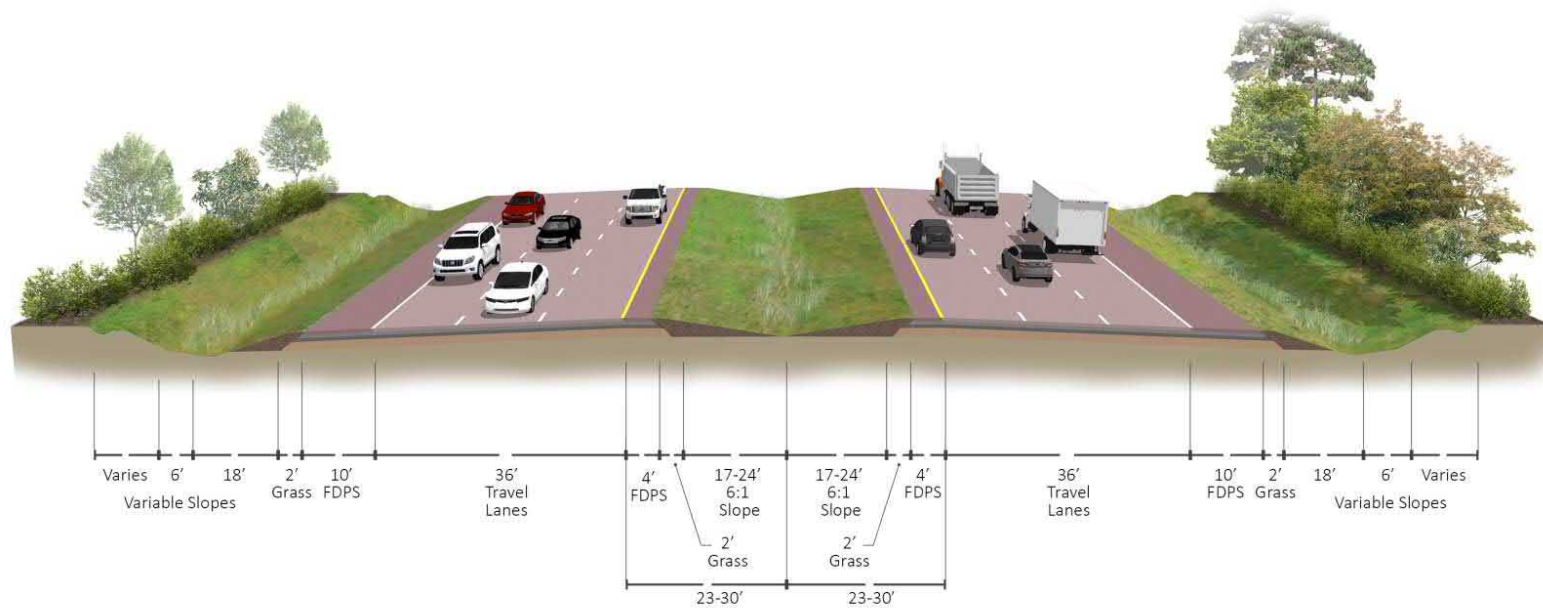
Current Detailed Study Alternatives Typical Section – six-lane arterial widening (US 17)
